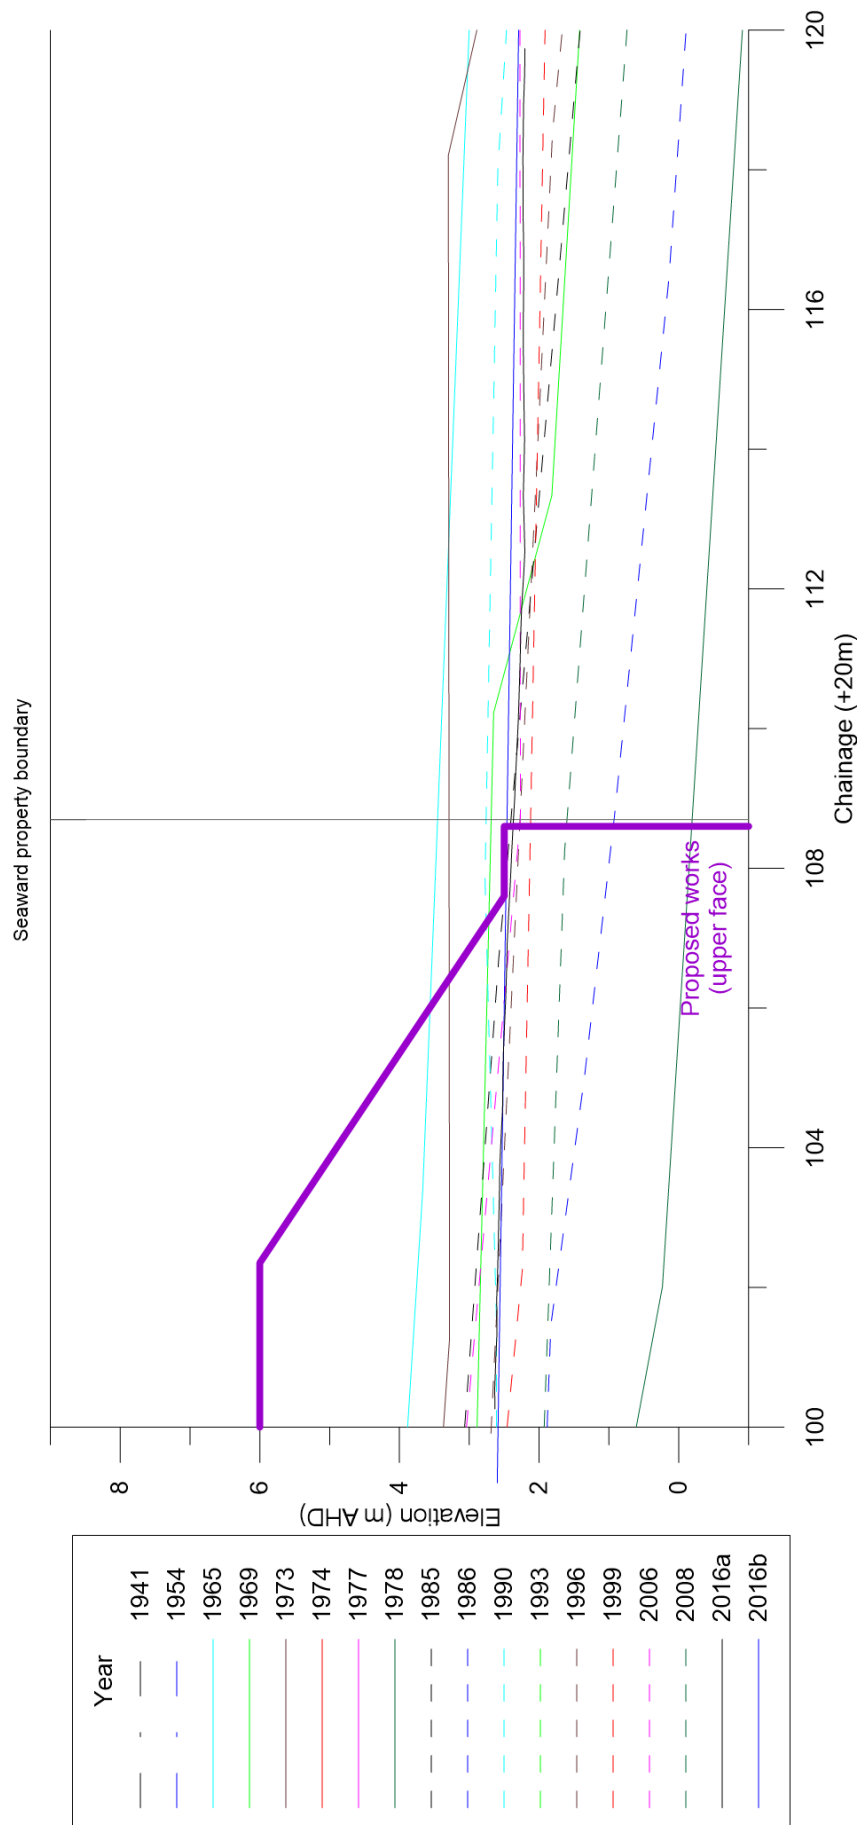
Receded beach profiles at Profile 1, with outline of upper face of proposed works shown
